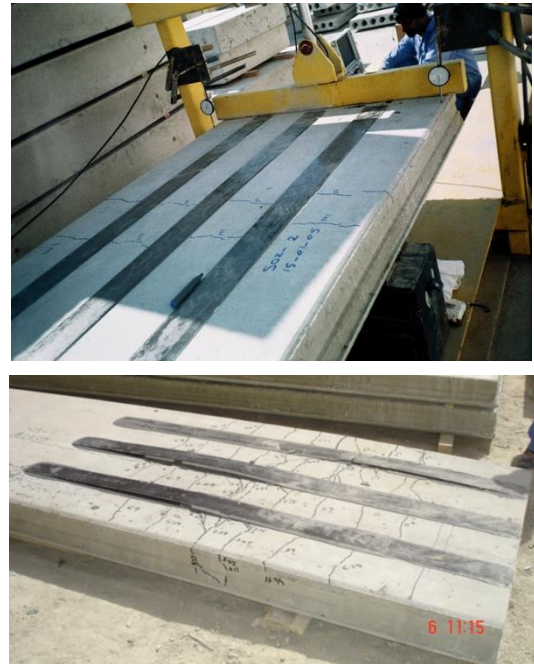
Hollow core slabs with bonded FRP (above) and interfacial debonding of the strips at failure (below).
